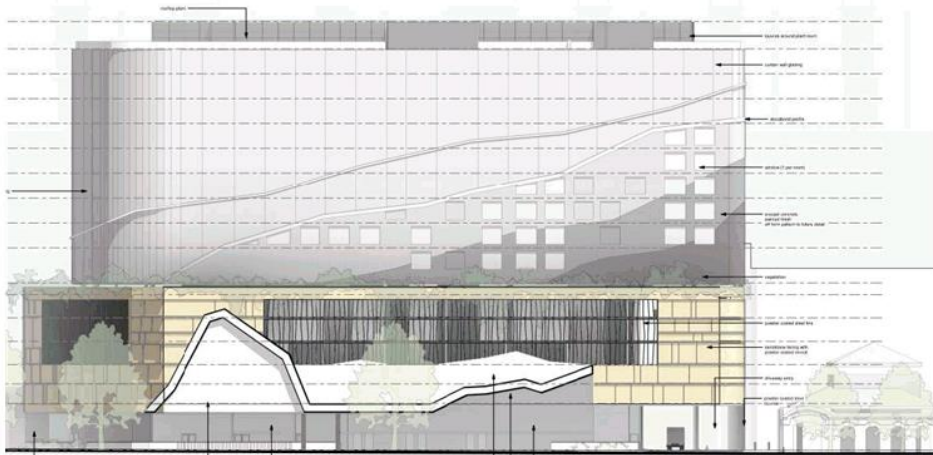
Collins Street Elevation (Excerpt from proposal plans).
